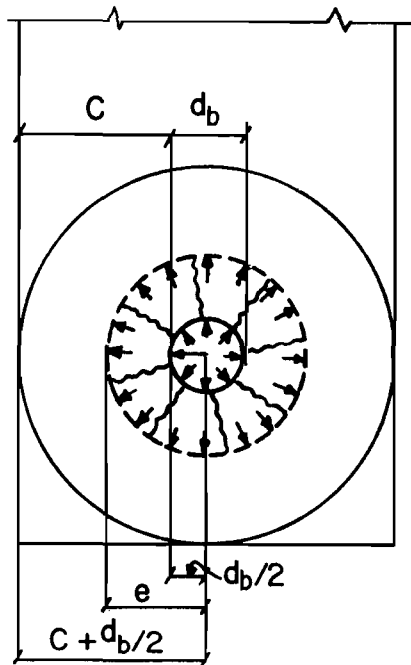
Internal cracks surrounding a deformed bar in concrete.
